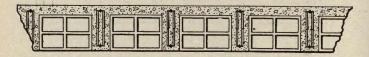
Beam and Tile Floor with Kahn Bars.
